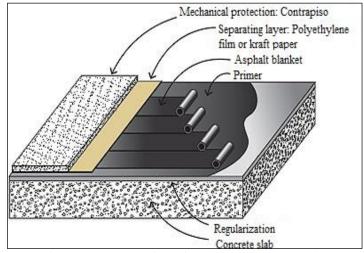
Waterproofing of asphalt blanket on a slab. Source: Adapted of [20].
